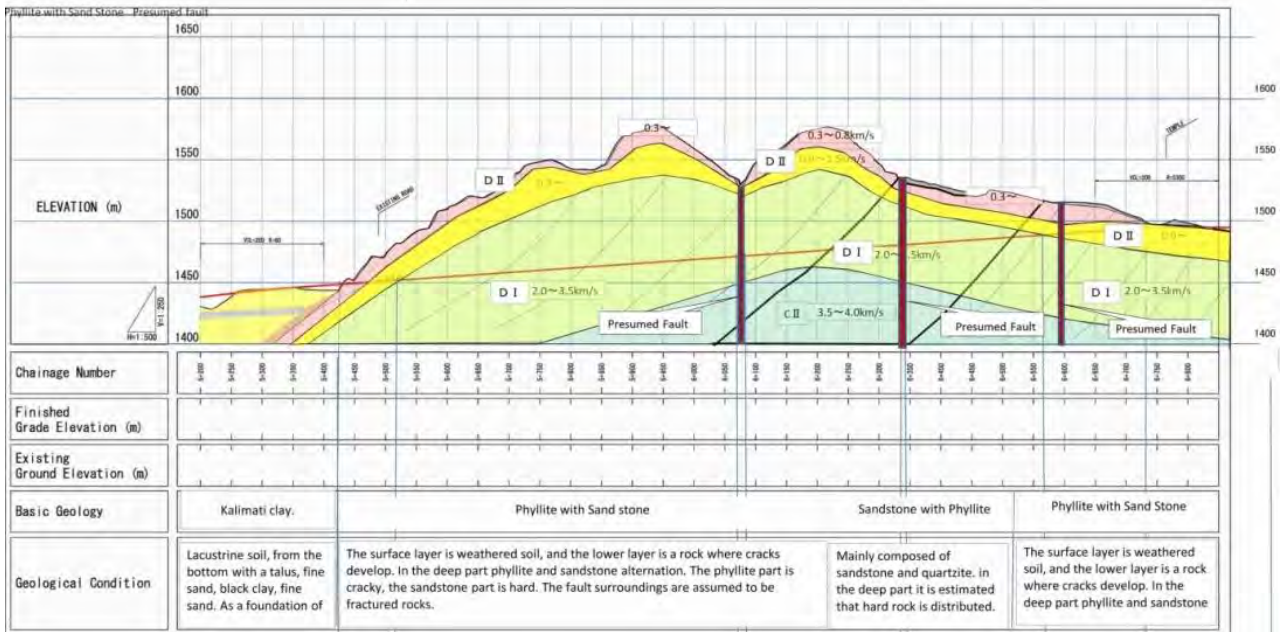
Rock Mass Classification along planned tunnel route
